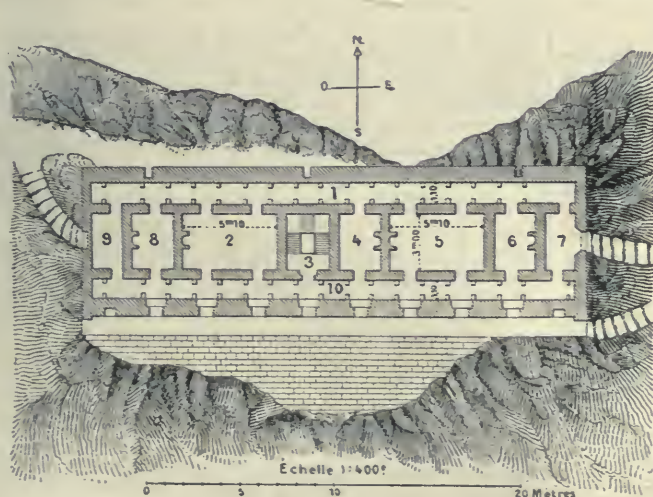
Plan and section of the New Observatory. Plan of the first floor:—1, Passage, magazine; 2, Salon; 3, Staircase; 4, Dining-room; 5, Work room; 6, Guest-chamber; 7, Telegraph; 8 and 9, Bed-rooms. The ground-floor will be used for provisions.
